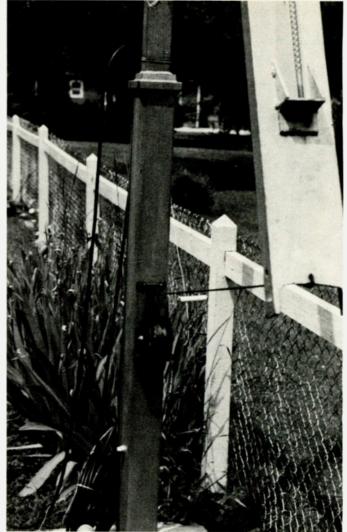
Photo E. Close-up of 6" channel iron showing how reinforcing rod fastens to channel iron and is threaded to receive nut. Also shows slot in base section to receive pulley over which cable travels.
